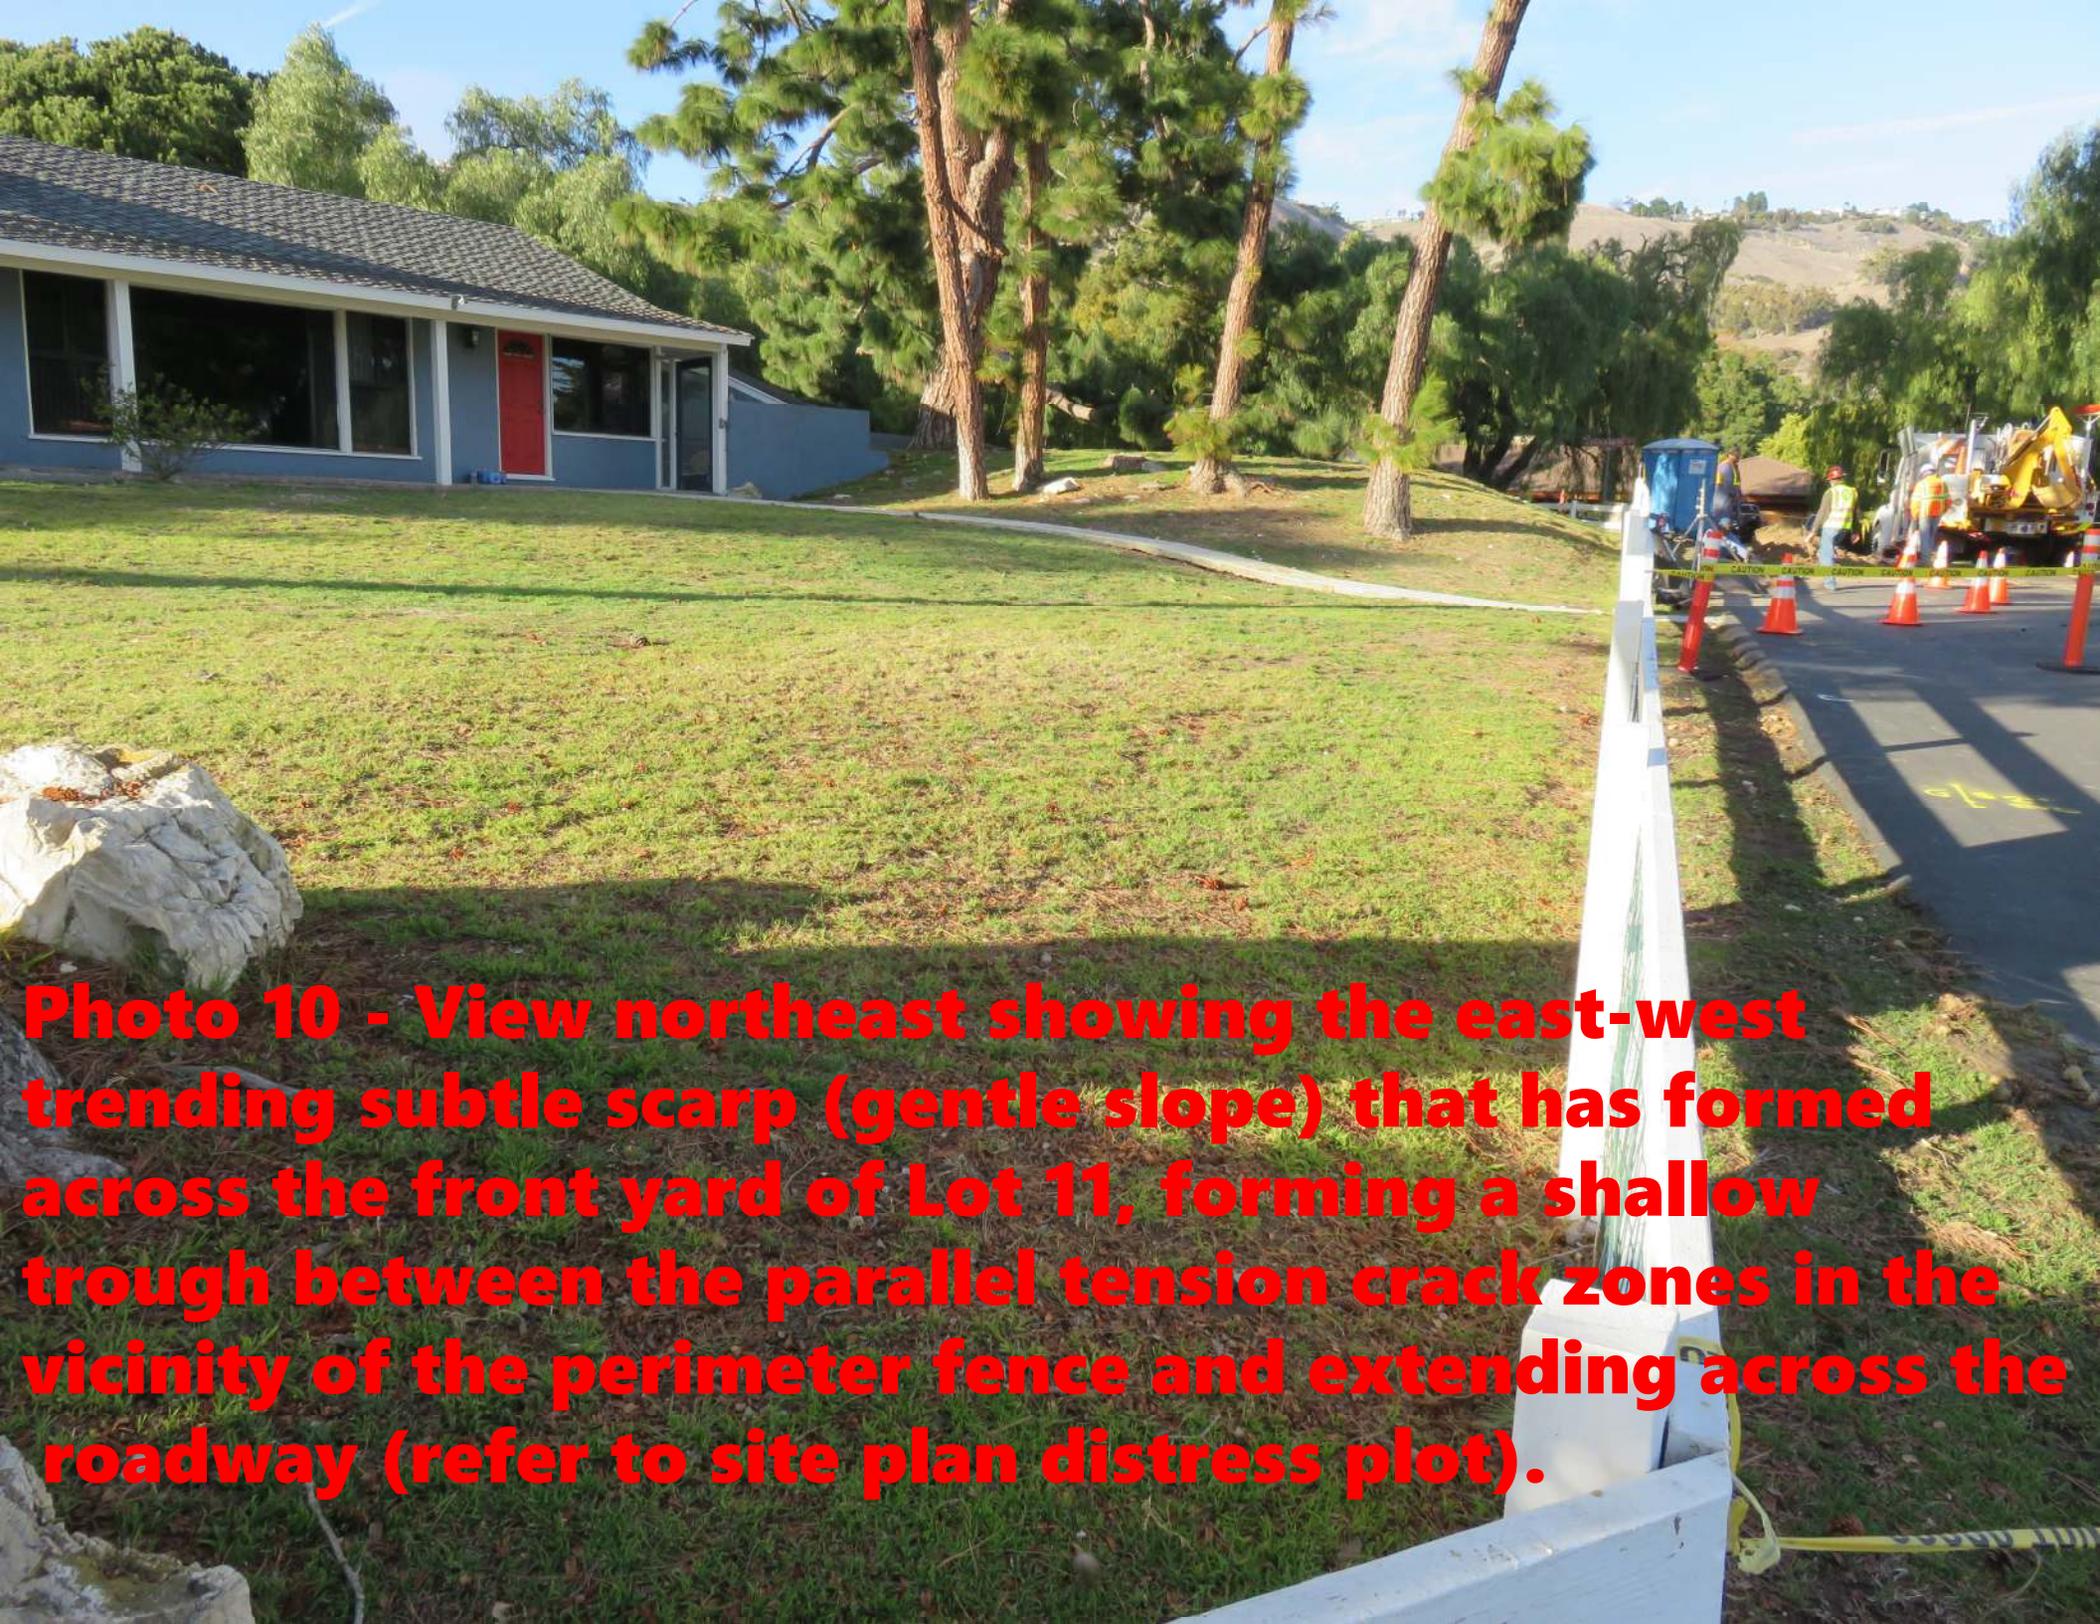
View northeast showing the east-west trending subtle scarp (gentle slope) that has formed across the front yard of Lot 11, forming a shallow trough between the parallel tension crack zones in the vicinity of the perimeter fence and extending across the roadway (refer to site plan distress plot).
